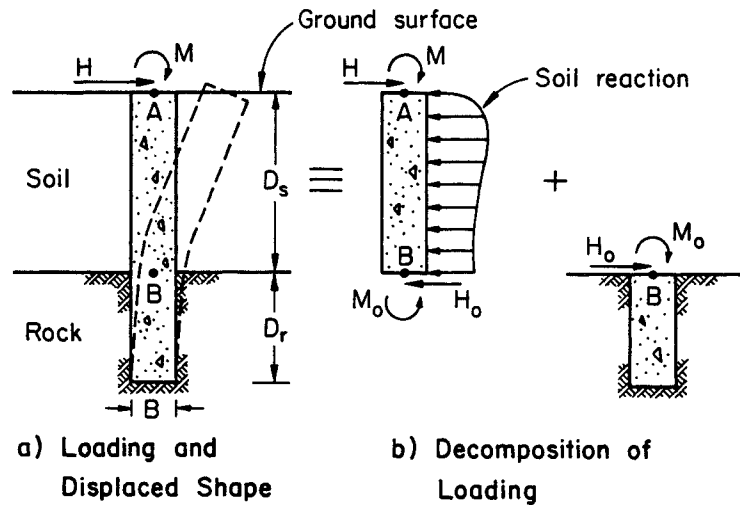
Rock Socketed Shaft under Lateral Loading with Overlying Soil Layer
